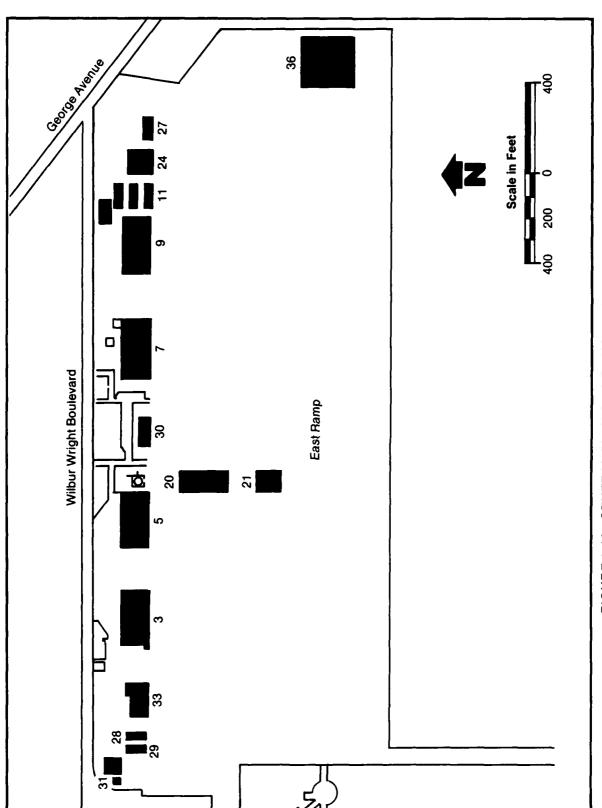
GENERAL PLAN OF SITE NO. 7 - EAST RAMP
